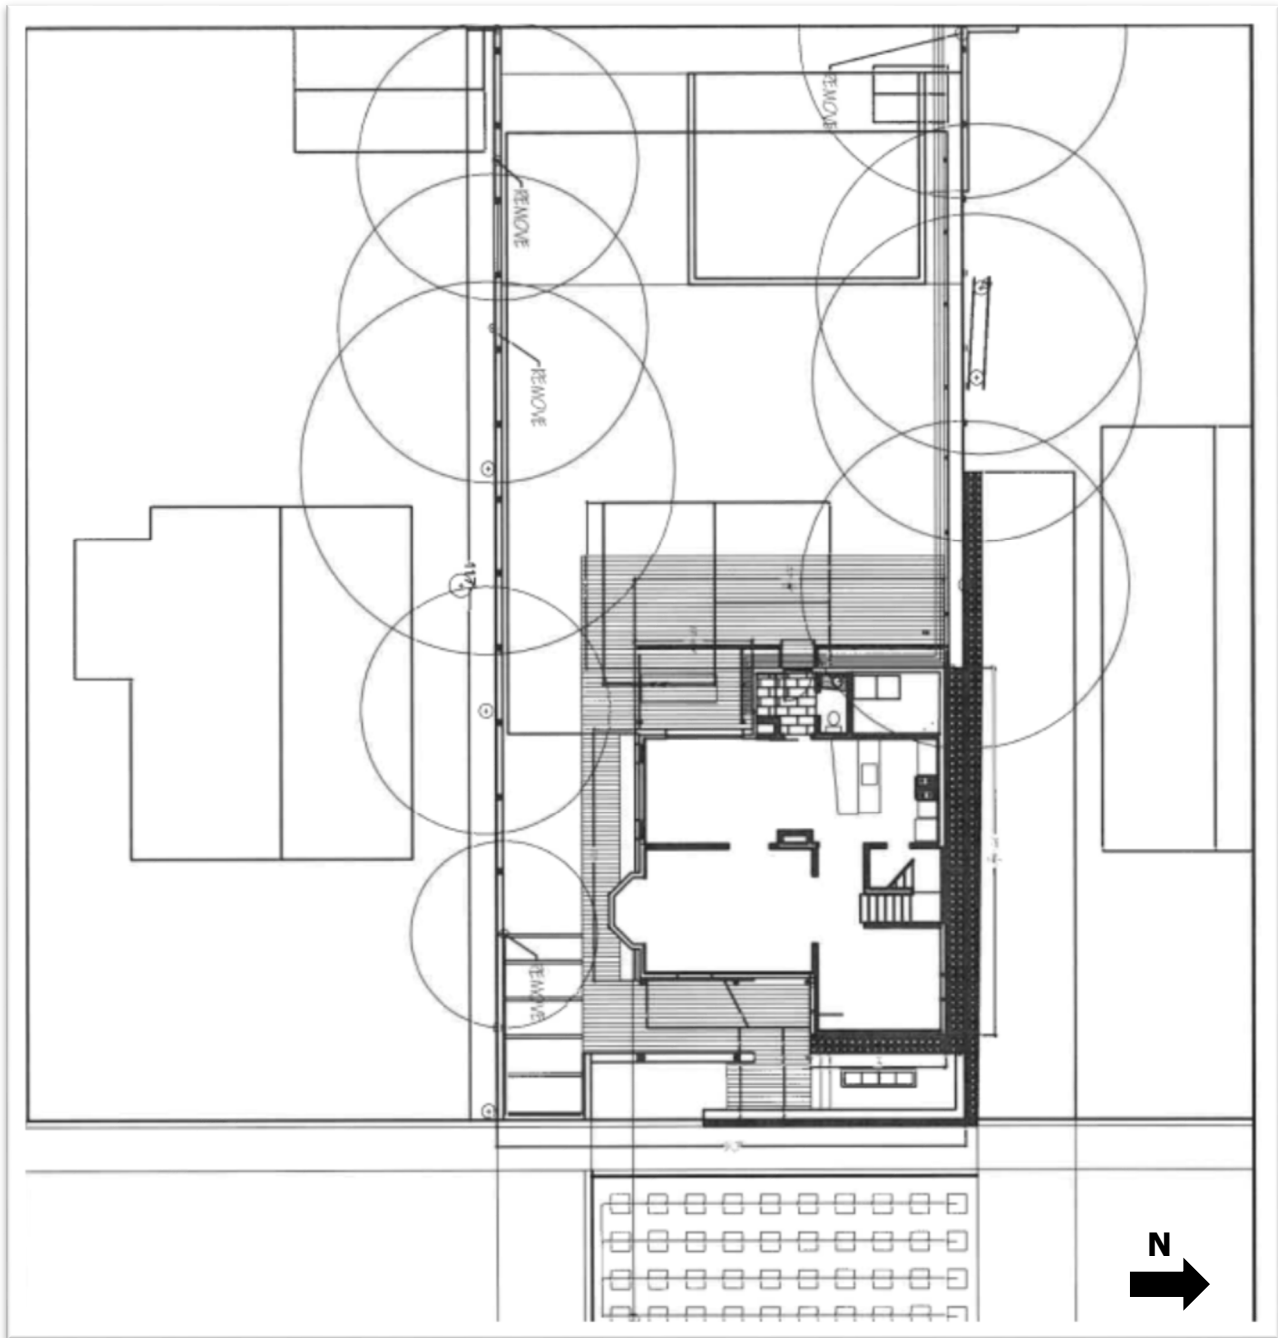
Proposed site plan for subject property. Subject property faces east and fronts Pennsylvania Street.
